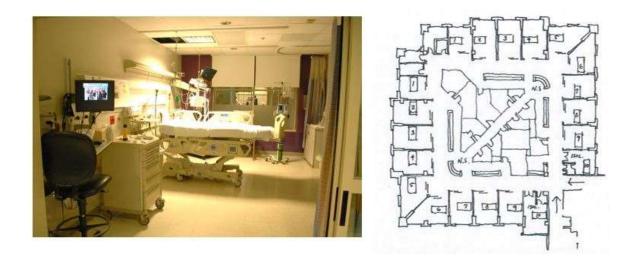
Unit HW room & plan: Same-handed rooms; beds parallel to corridor
